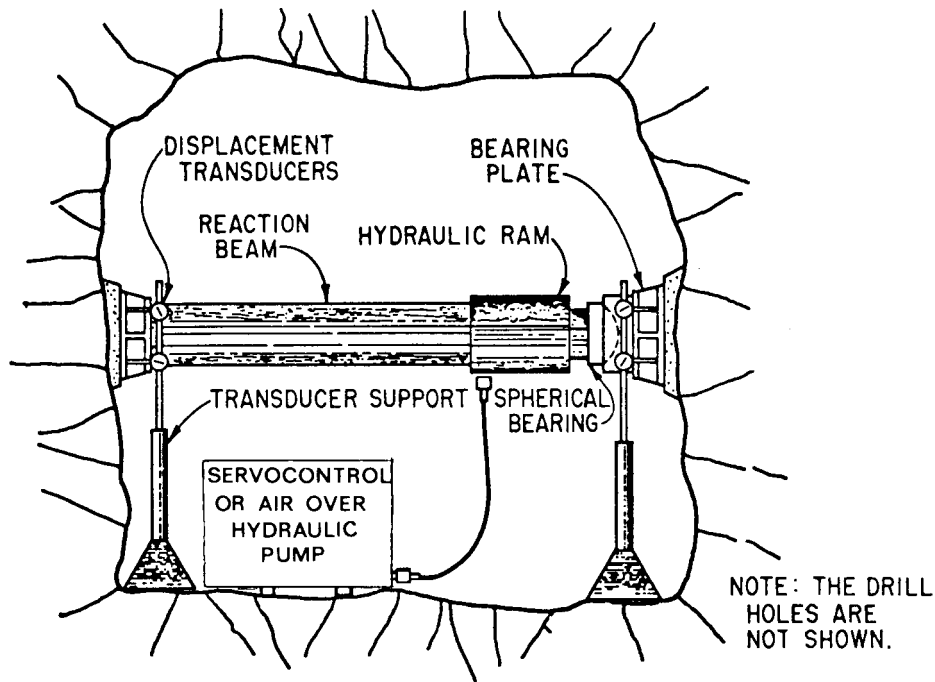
Typical Rigid Plate Bearing Test Setup Schematic
